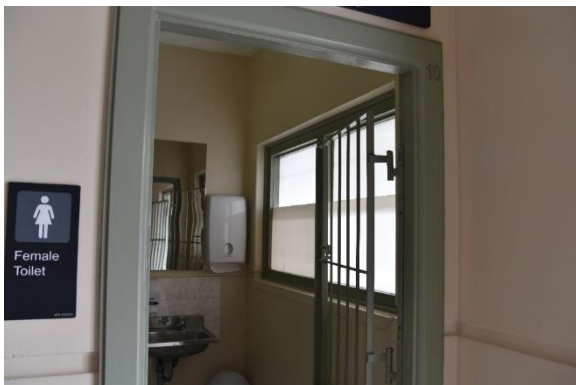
The women's bathroom, view south-east (Source: Artefact 2021)
